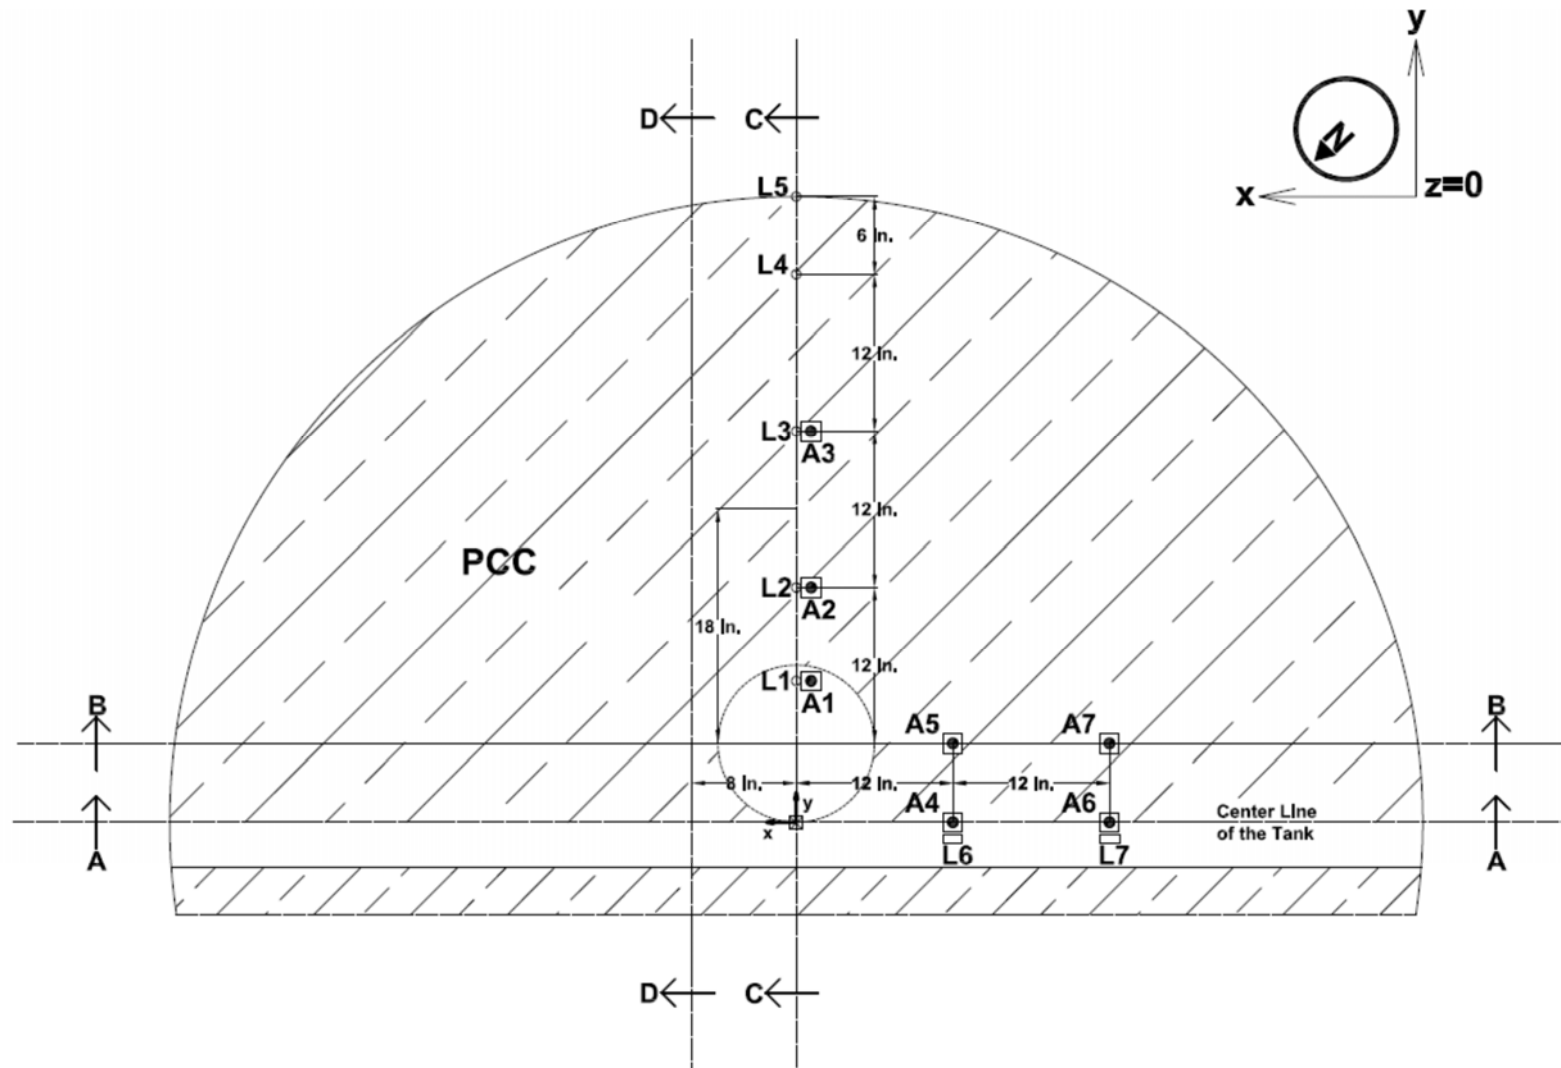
Instrumentation plan for experiment No. 9—Plan view, Z=0 inch
